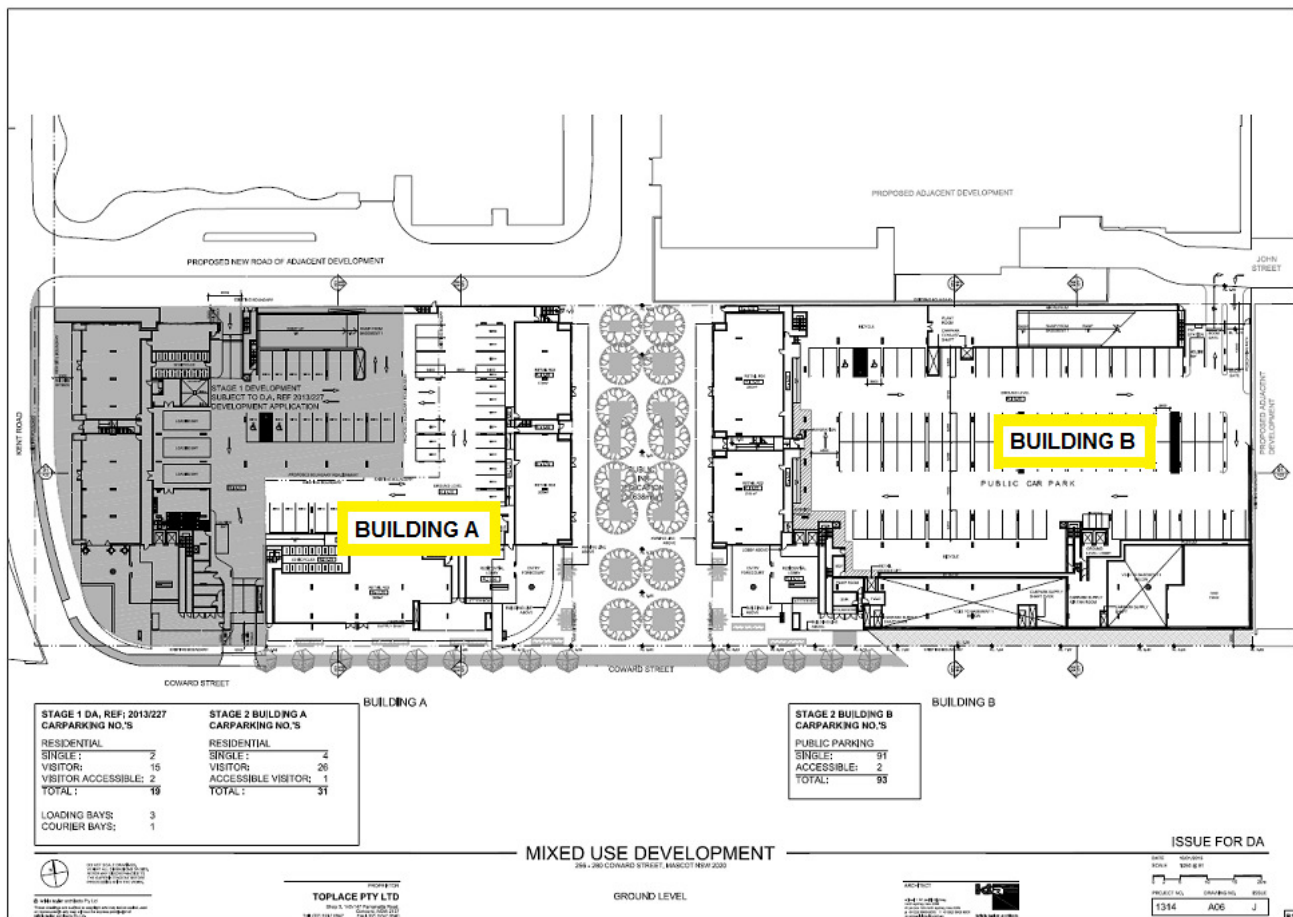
Approved site plan for DA-2014/145, with mark ups showing Building A and Building B (greyed area subject to a separate DA consent).
